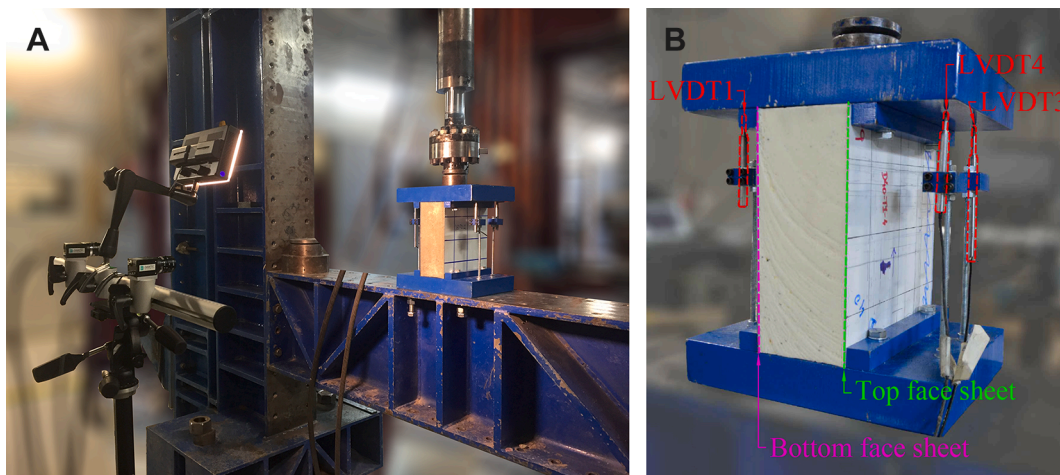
Edgewise compressive test: (a) overall setup and DIC equipment; (b) specimen.
